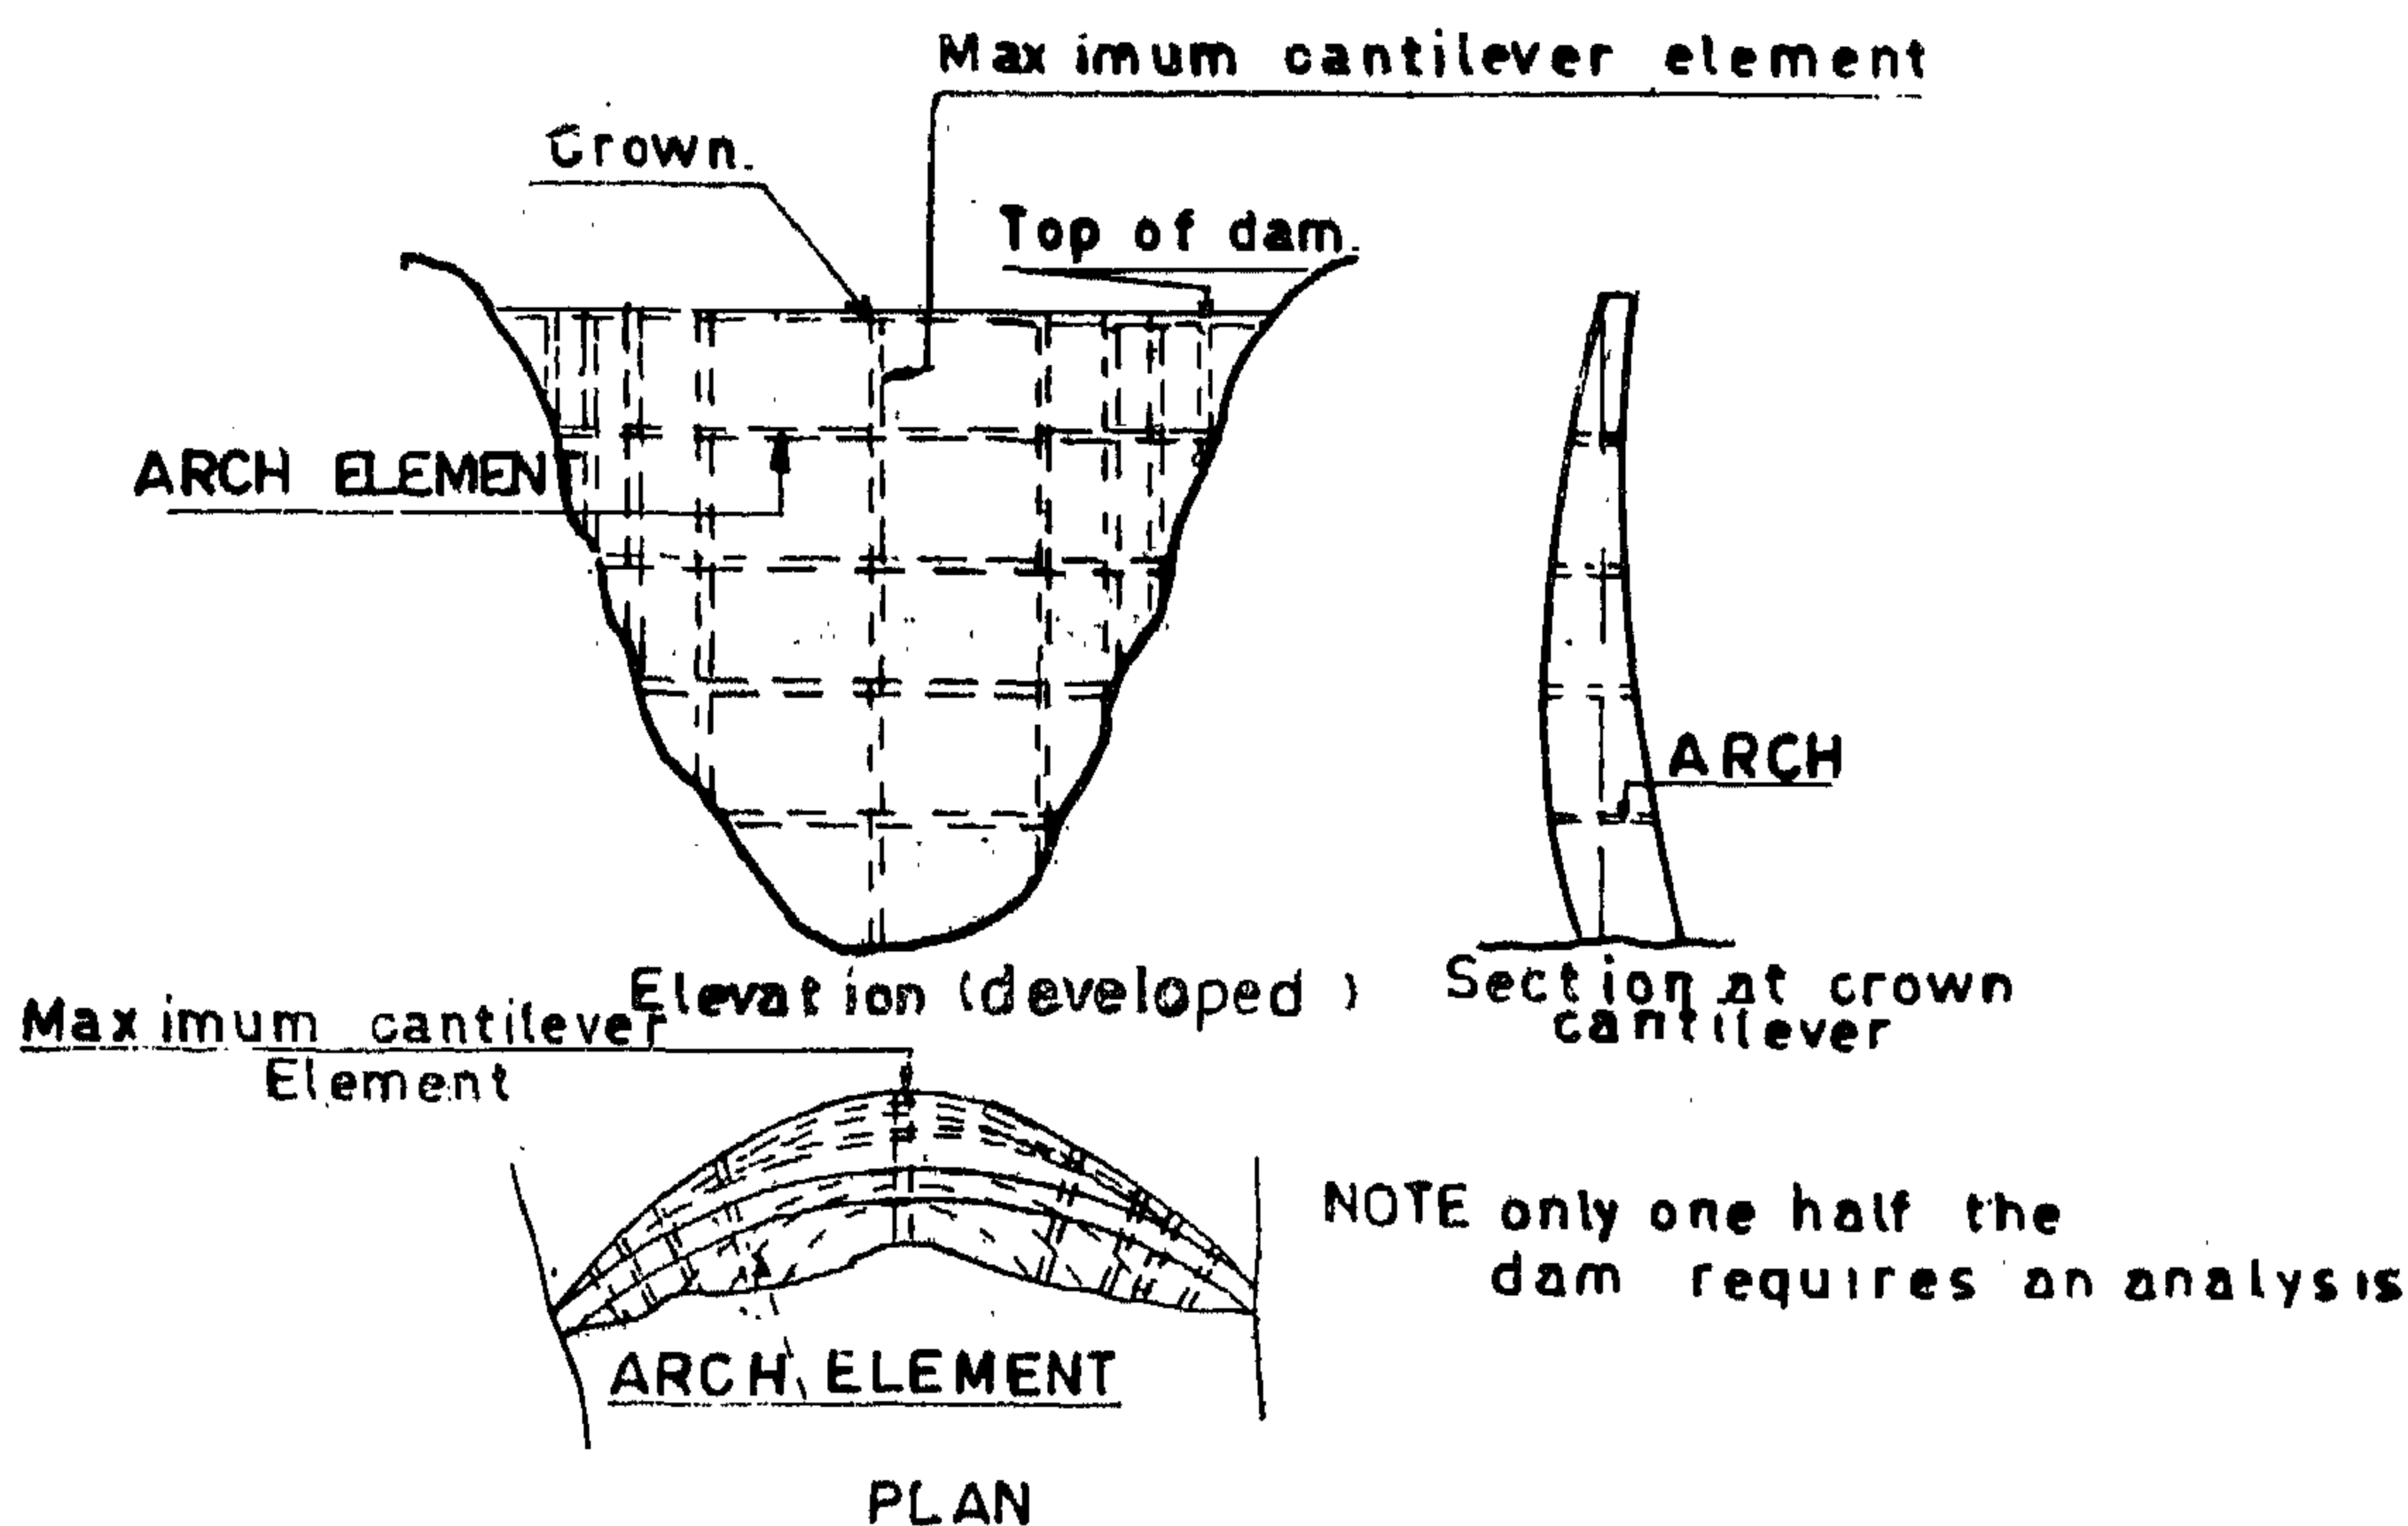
PLAN, PROFILE AND SECTION OF SYMMETRICAL ARCH DAM
